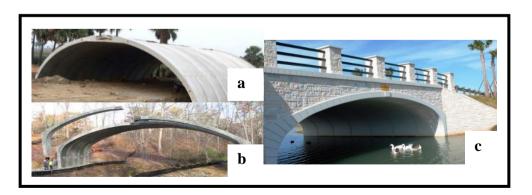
Example of Precast concrete arch bridge a) BEBO Precast Concrete Arch Bridge (http://www.strataindia.com) b) Eco-Span Arch Bridges (http://eco-span.comc) Tricon Precast Bridges (http://www.triconprecast.com)
